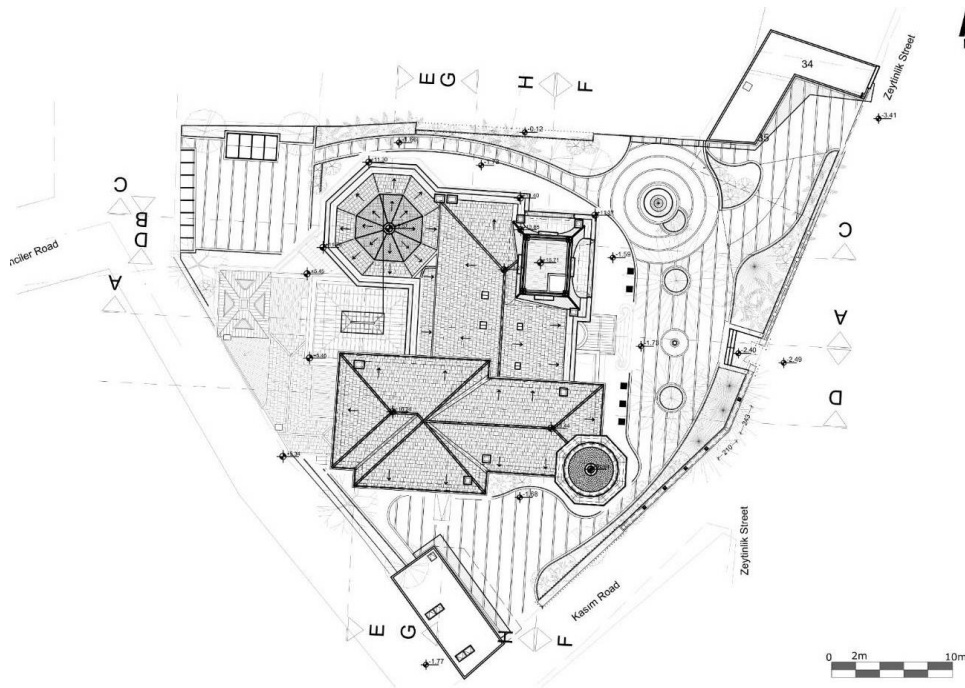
First floor (Restoration) (Kuleli, 2013).
